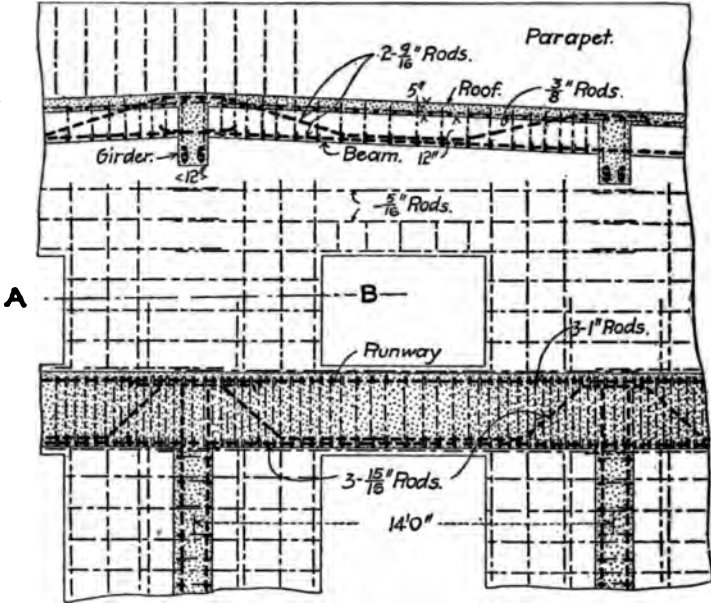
Transverse Section of Sub-station Building, Brooklyn Rapid Transit Co.
